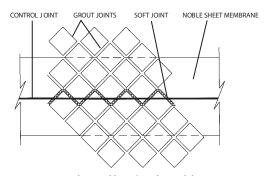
JOINT BRIDGING - CROSS SECTION
